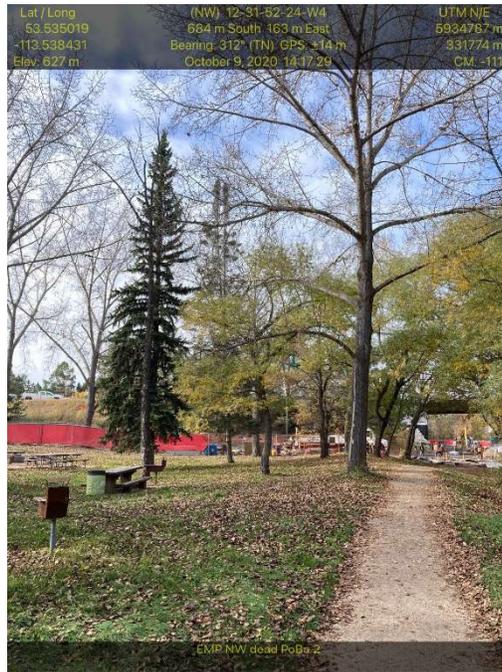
Western portion of the Site. View facing northwest, looking at the proposed western pathway section, where it joins to the existing gravel pathway (October 9, 2020).
